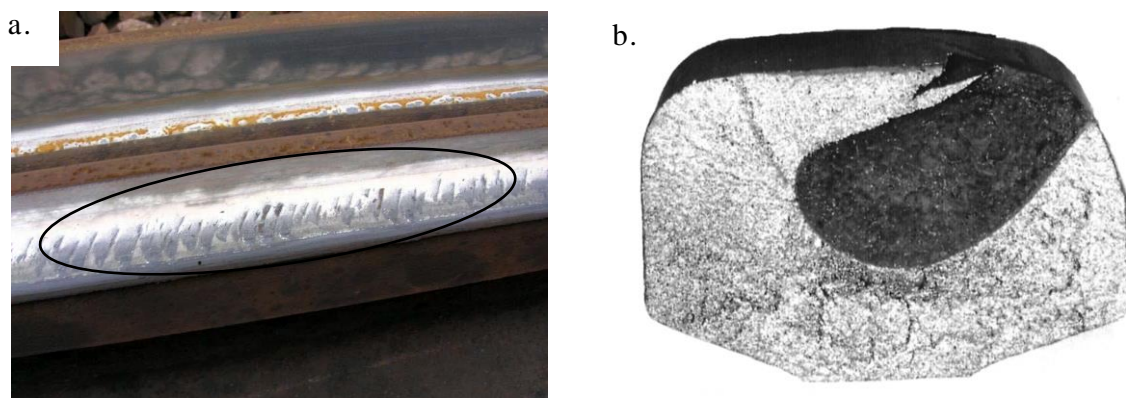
Representation of head checking on a rail head [25]. a. Early initiation of head checking on a rail head; b. Representation of a broken rail due to head checking.
